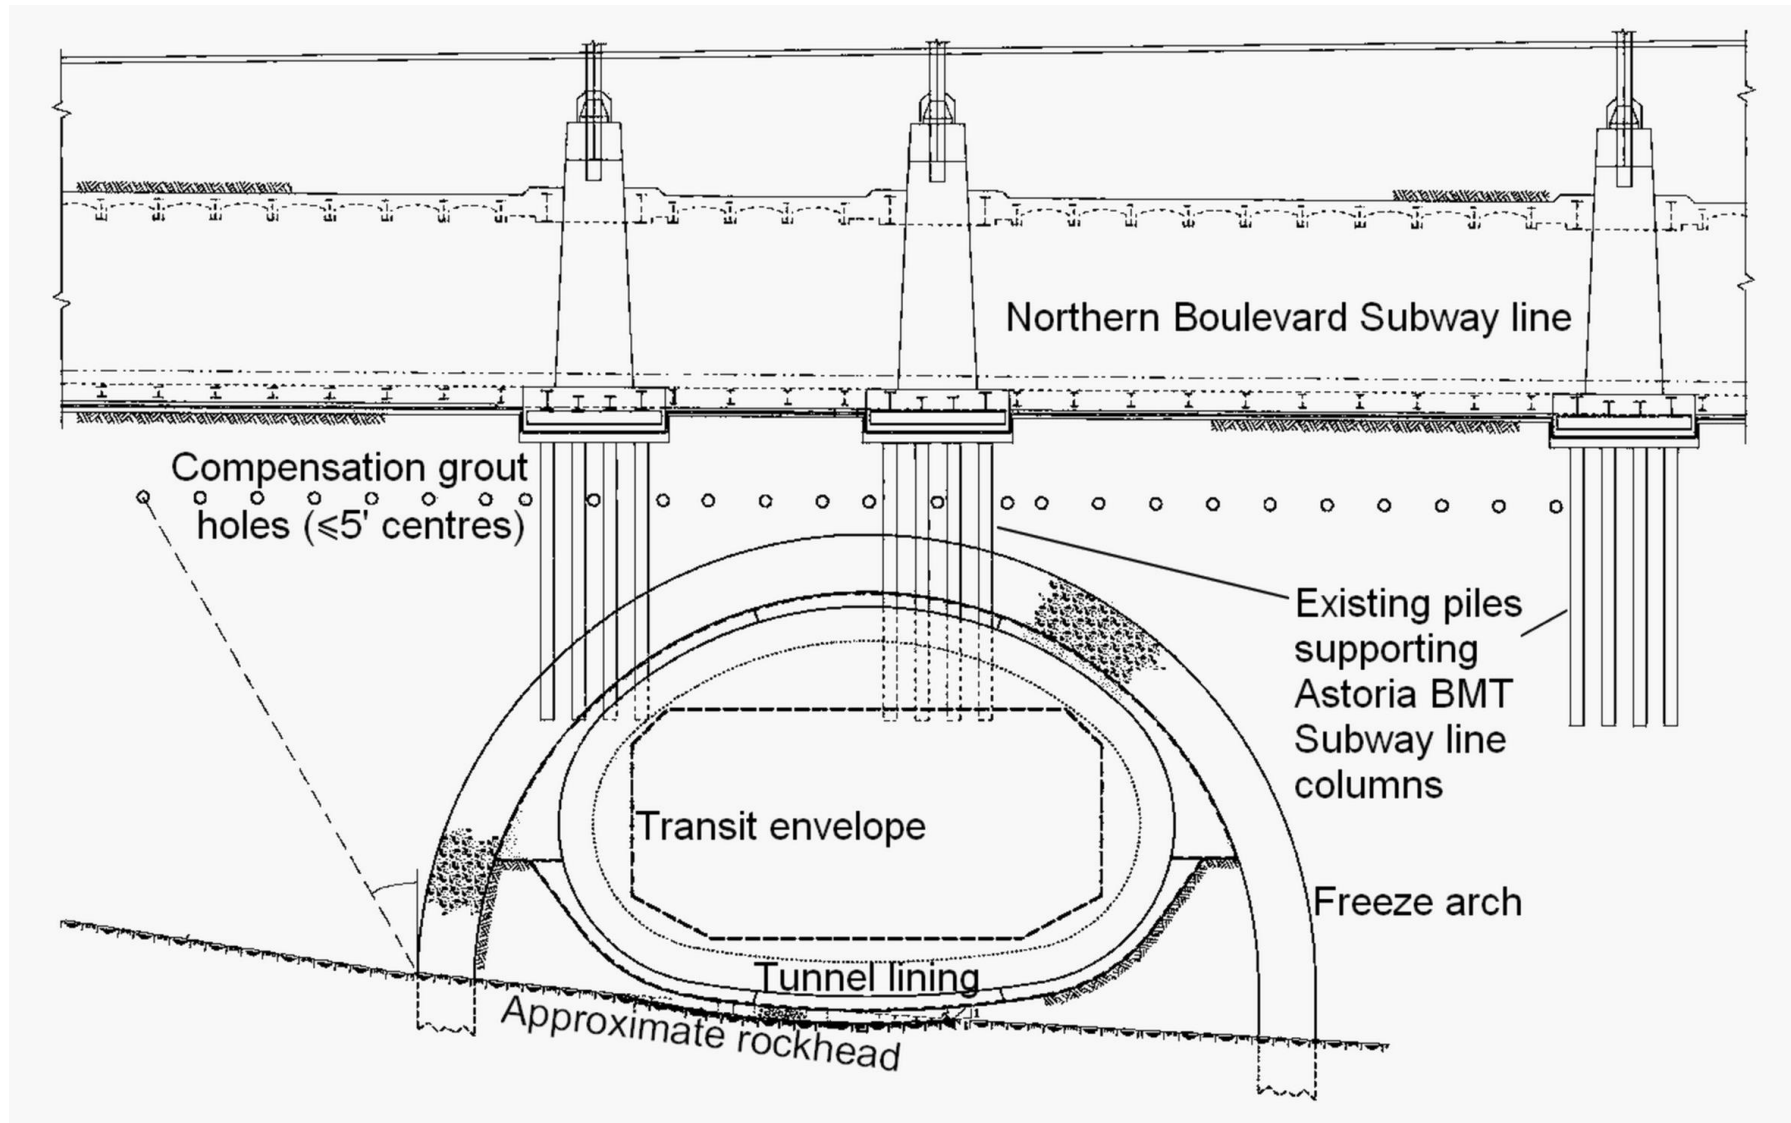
Cross section of tunnel and frozen arch (adapted from Rice, 2012).
